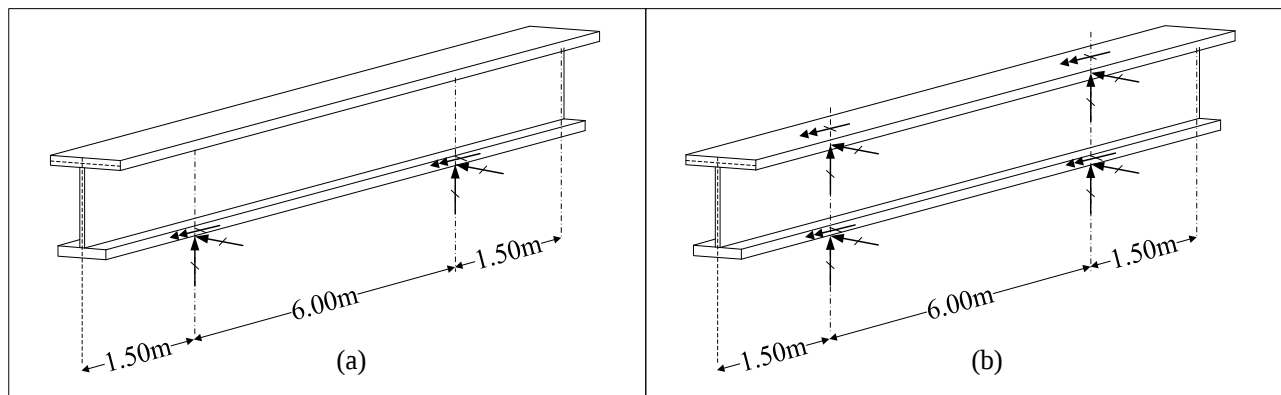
Point supports at beam-column junction, a) no stiffeners provided b) stiffeners provided.
